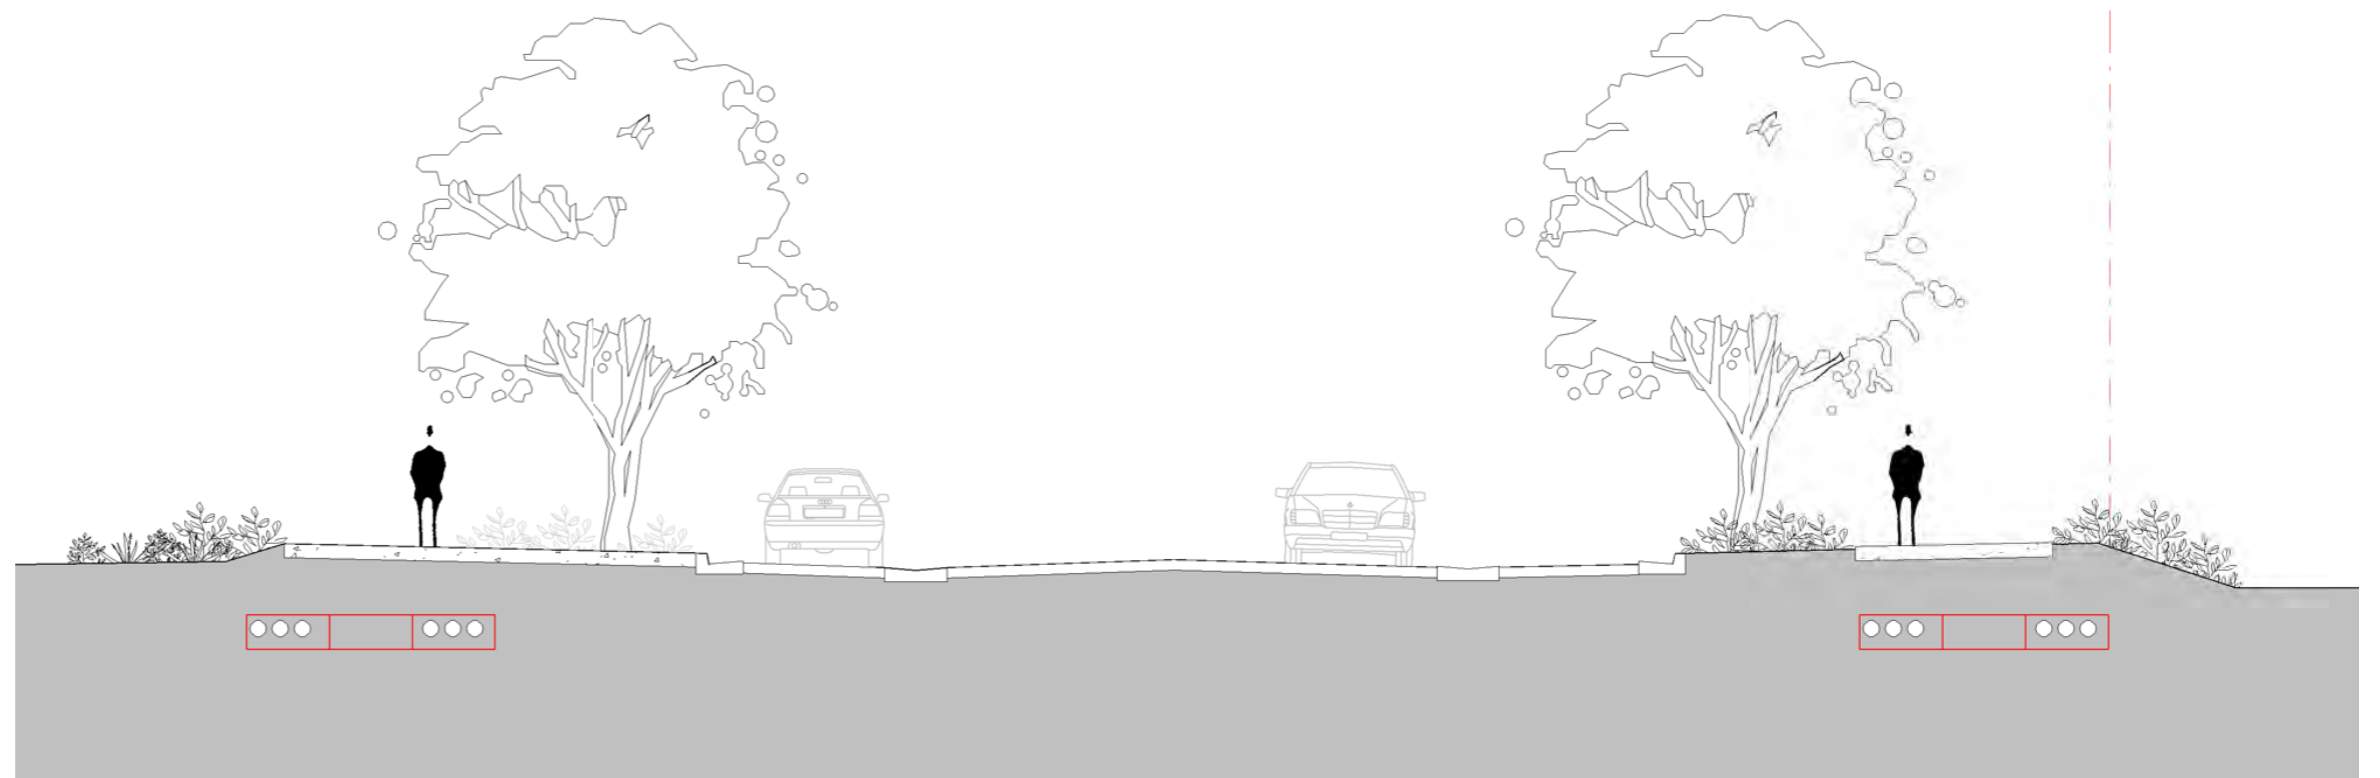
KVE\_Section of Precinct Street D. Source: HASSELL.
